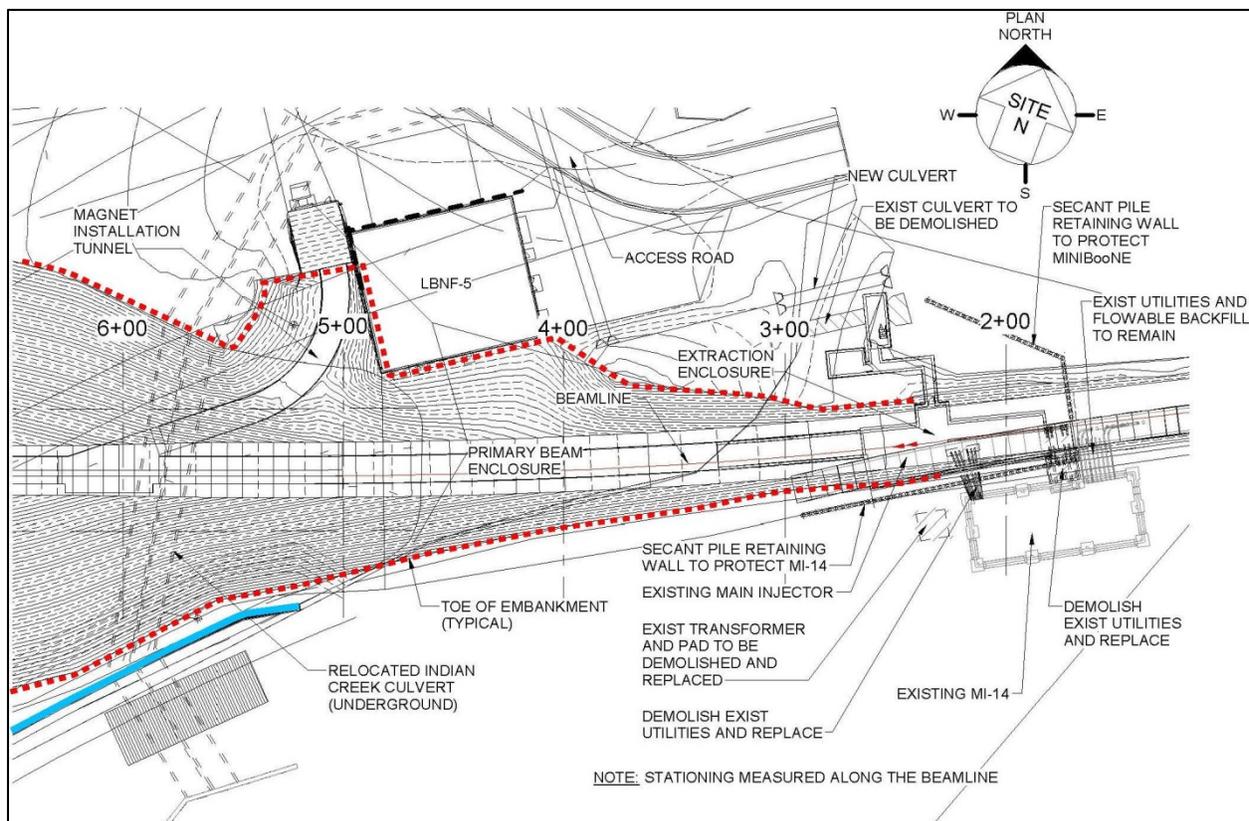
Braced Excavation and Retaining Wall Systems with the Toe of the Embankment Shown in Red and the Slurry Trench in Blue
